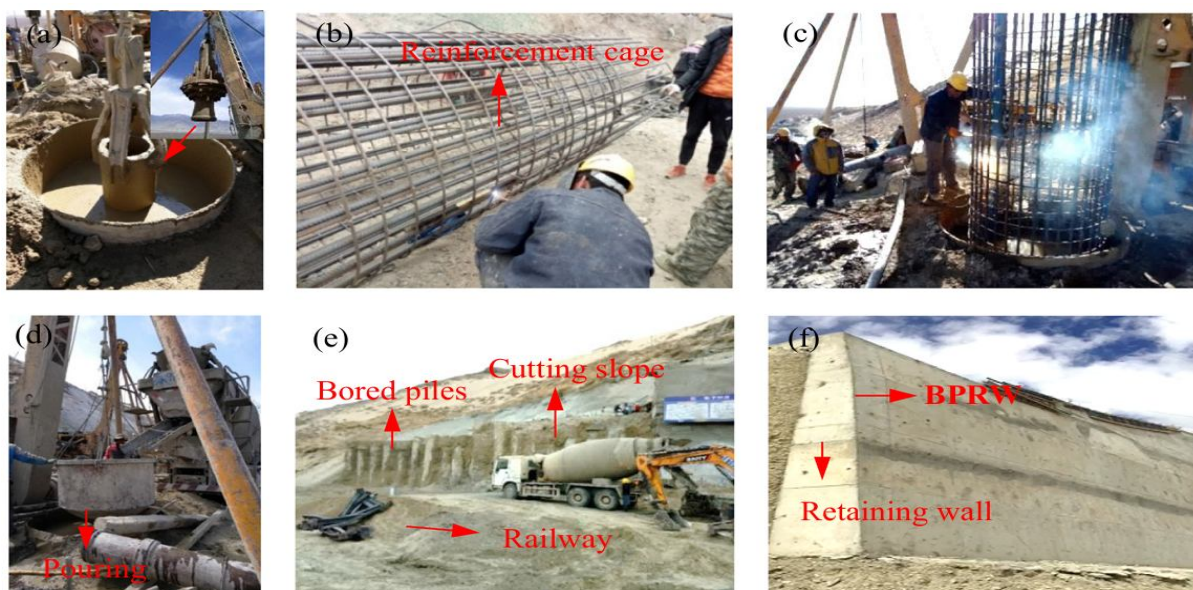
On-site construction process of the BPRWs: (a) Drilling of the bored piles with a percussion drill; (b) reinforcement cage welding; (c) reinforcement cage lengthening; (d) concrete pouring; (e) slope excavation; and (f) retaining wall pouring. [13]
